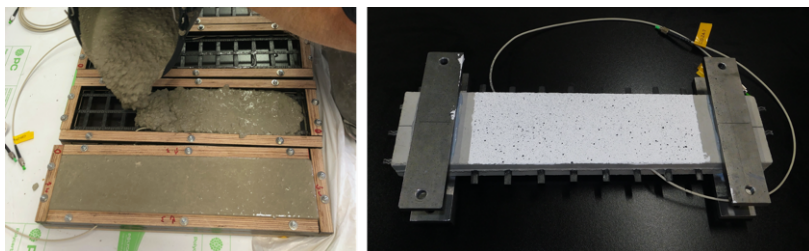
Concreting of specimens for tensile tests (left) and preparation for tensile test - clamping steel plates and DIC area visible (right)
